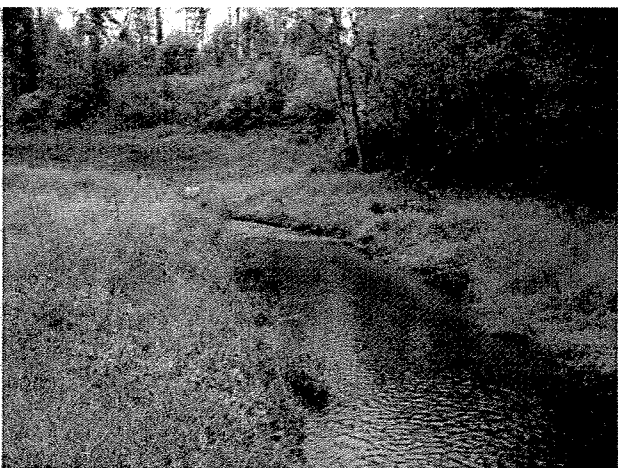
Looking upstream at rock cross vane installed at MS Station 44+38. (9/27/04)
